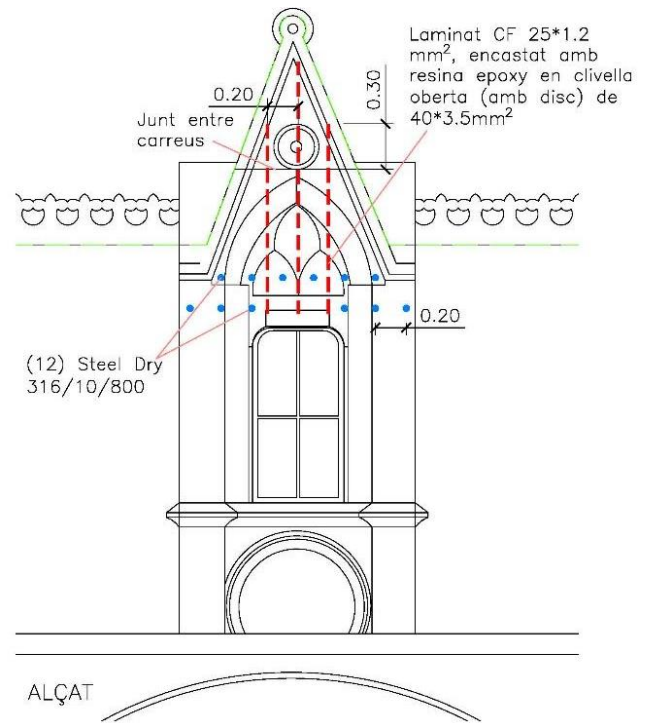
Elevation showing the proposed reinforcements for a good connection of the different components of the decorative element. ©Josep Baquer
